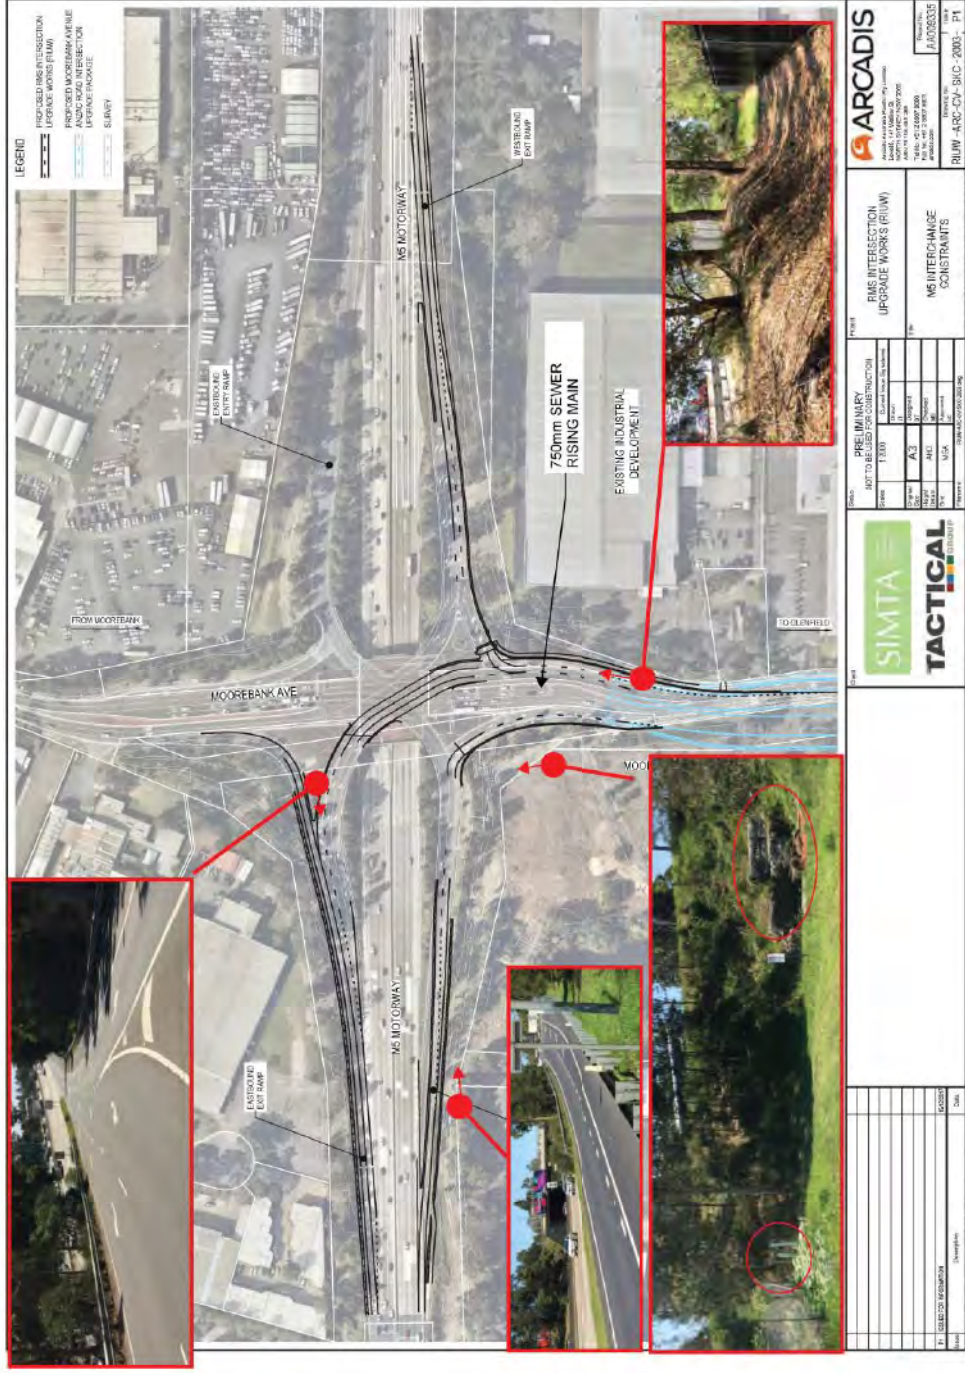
Indicative Layout Plan - Moorebank Avenue Road Upgrade near M5
